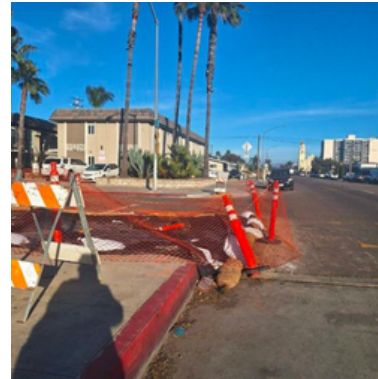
Construction blocking sidewalk at the corner of Orange Ave. & Central Ave.
